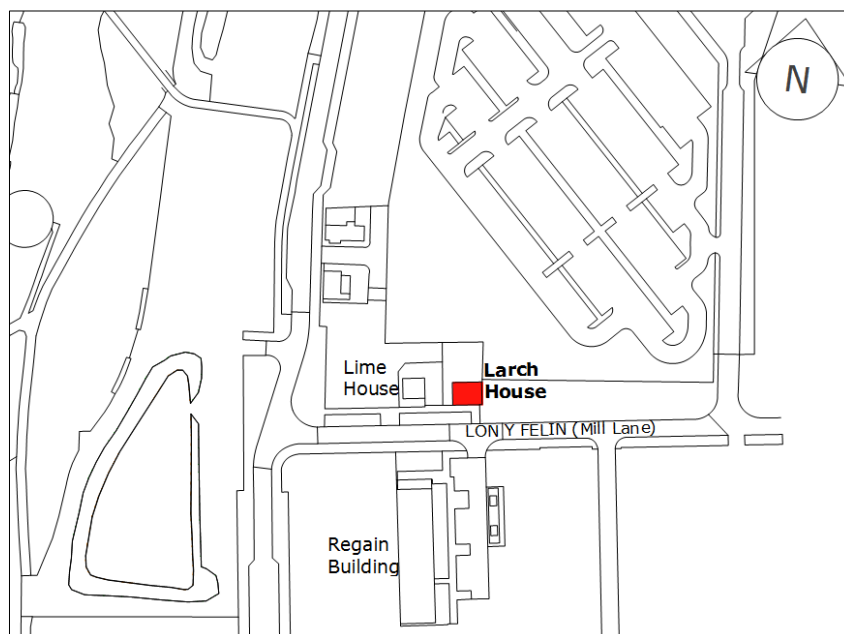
Location plan of the Larch House- Ebbw Vale
